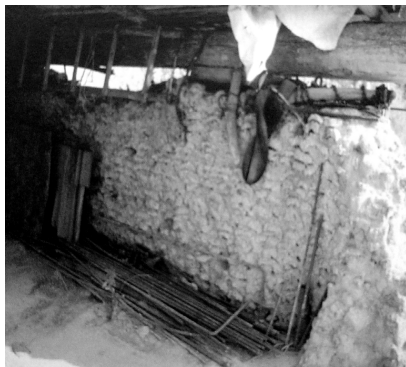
Wall made of Cork and Earth in Cortiçadas.
